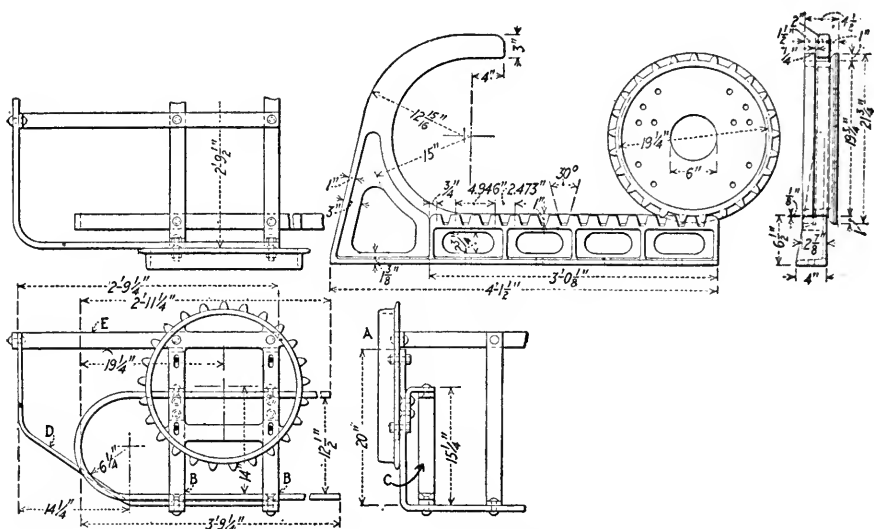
CRADLE DUMP OF ST. LOUIS SMELTING & REFINING CO.
